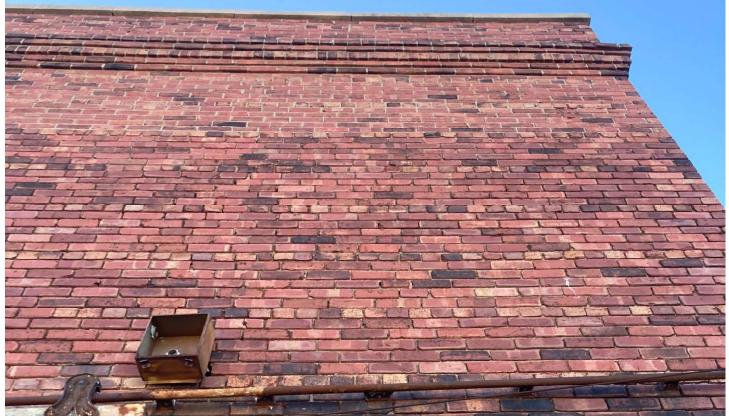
Brick Wall and Corbelling at Elevator Tower
